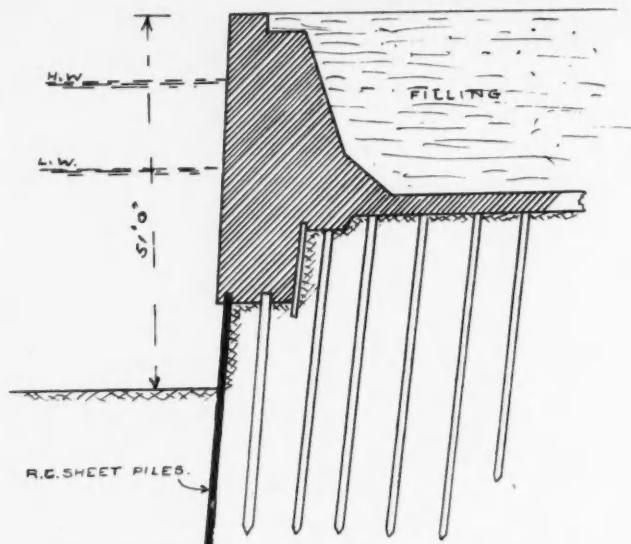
Typical cross section of wall where sheeting piles support toe.
